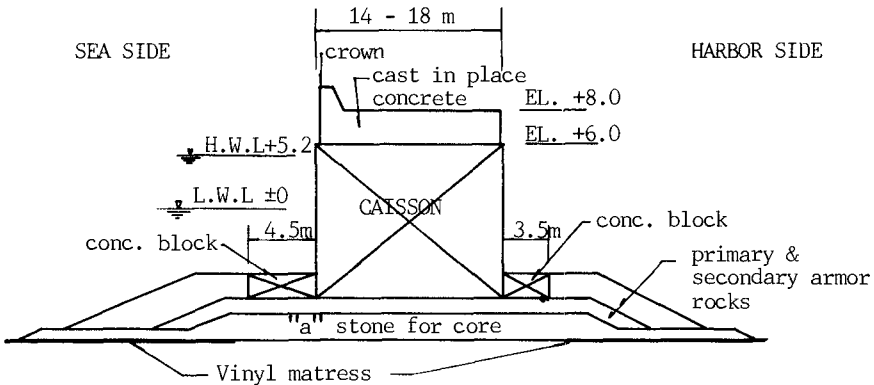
Typical cross section of composite type breakwater at Taichung Harbor
